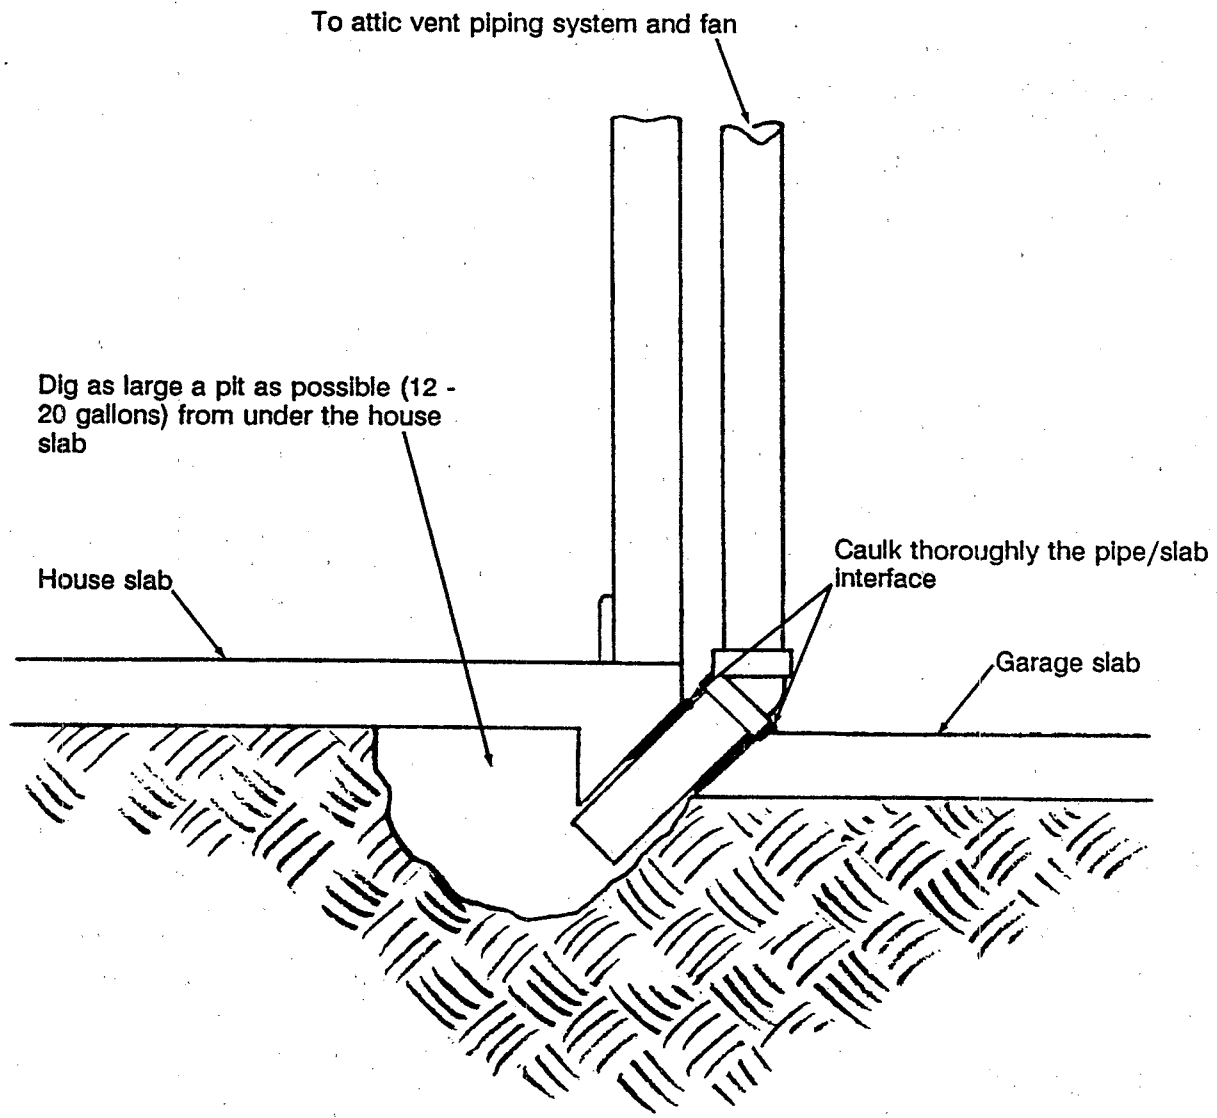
Illustration of a garage suction pipe 45° installation to a pit under the house slab in a house where the garage slab is a step-down form pour from the house slab.
